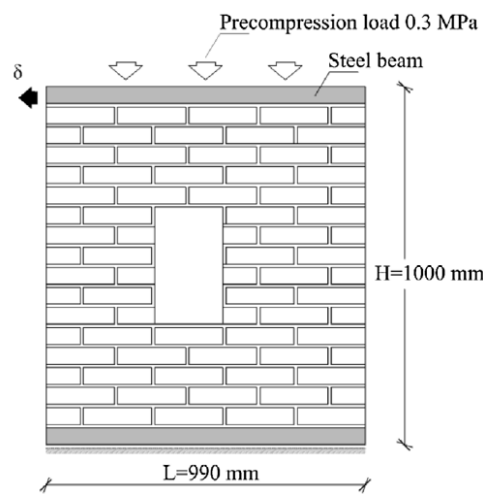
Masonry windowed panel: geometry and load conditions.
